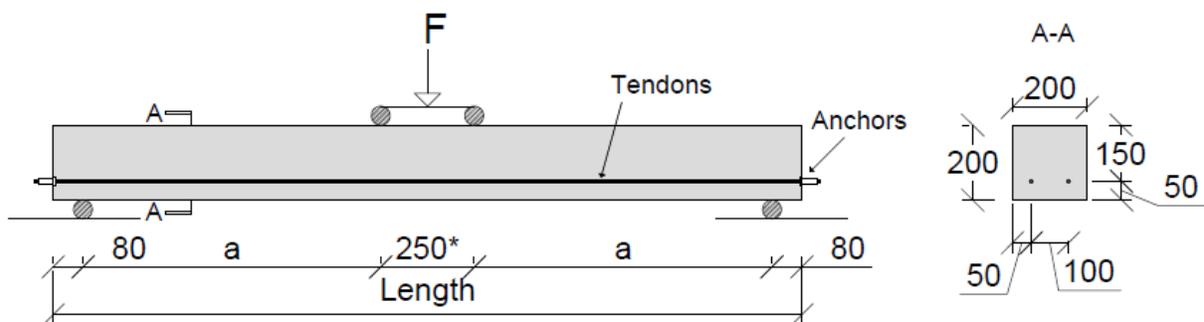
Schematic drawing (not to scale) of the bending test setup and the beams cross section. The parameters Length and a , are listed in Table 1. The depth, d , was in all cases 150 mm.
